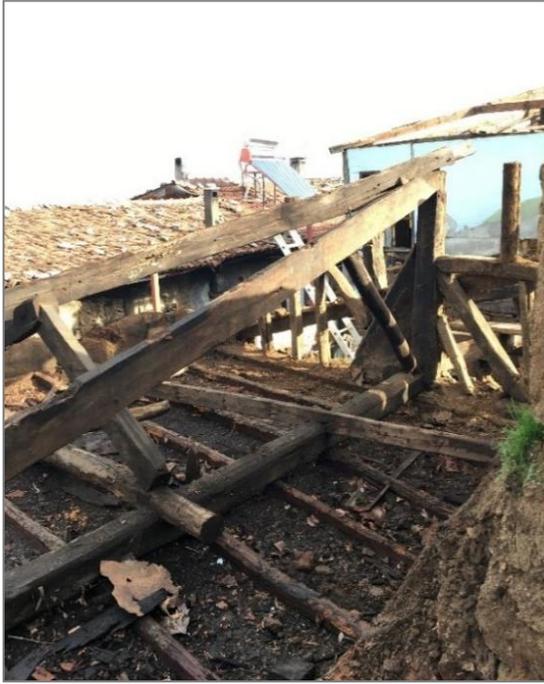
Photographs from first site survey: dismantling of the building 2819-1-9 (Group B)
